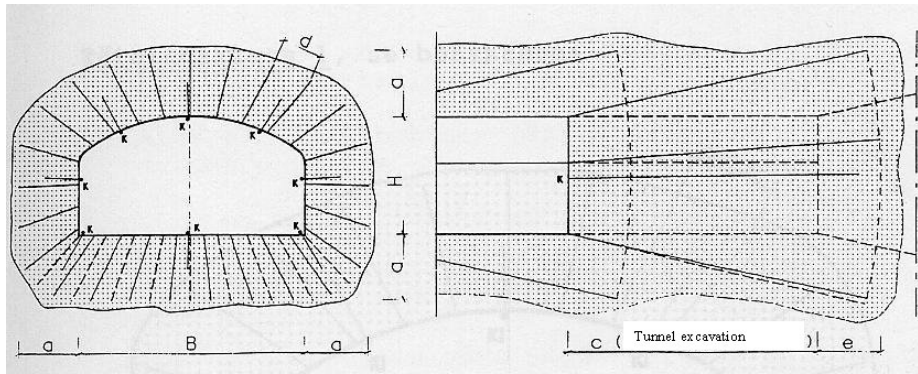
Typical layout of a grout trumpet surrounding a tunnel.
